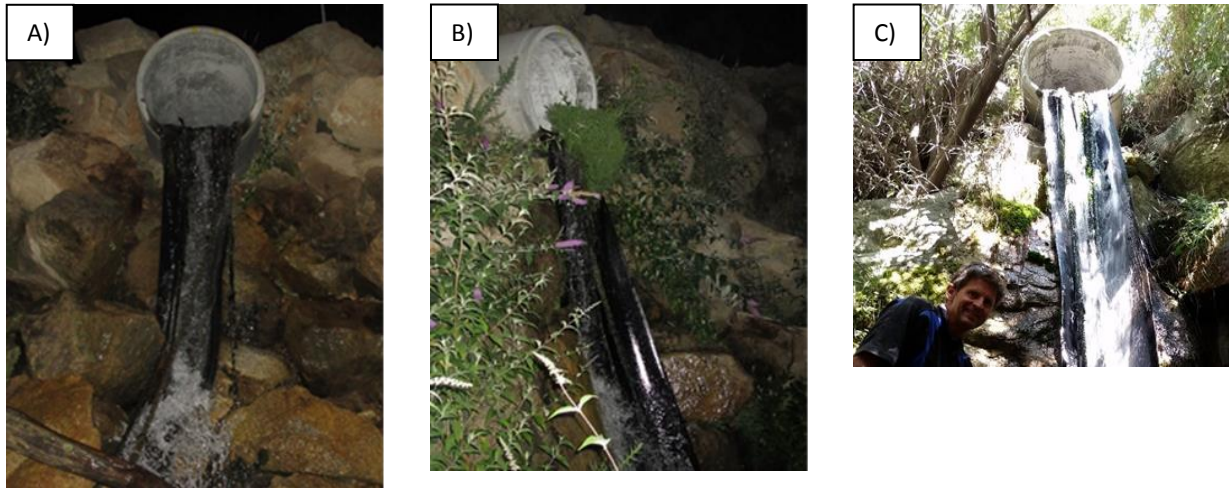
Examples of the retrofitted culverts with rubber apron and mussel spat rope on Tōtaranui and Awaroa Roads, Abel Tasman National Park in 2014. A) Culvert 9, B) Culvert 18, C) Culvert 31. (Photos: Tasman District Council)
